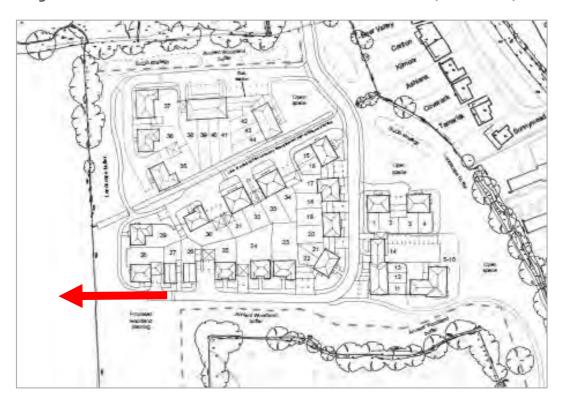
Potential Priority Junction on Turners Hill Road (Location B)
